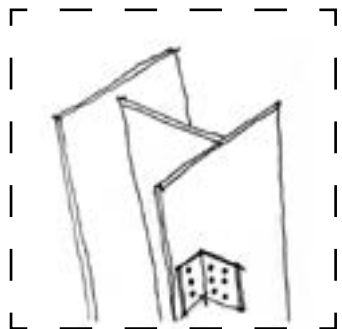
O: [DETAIL 8] Angle cleat bolted connection (Author, 2021)
